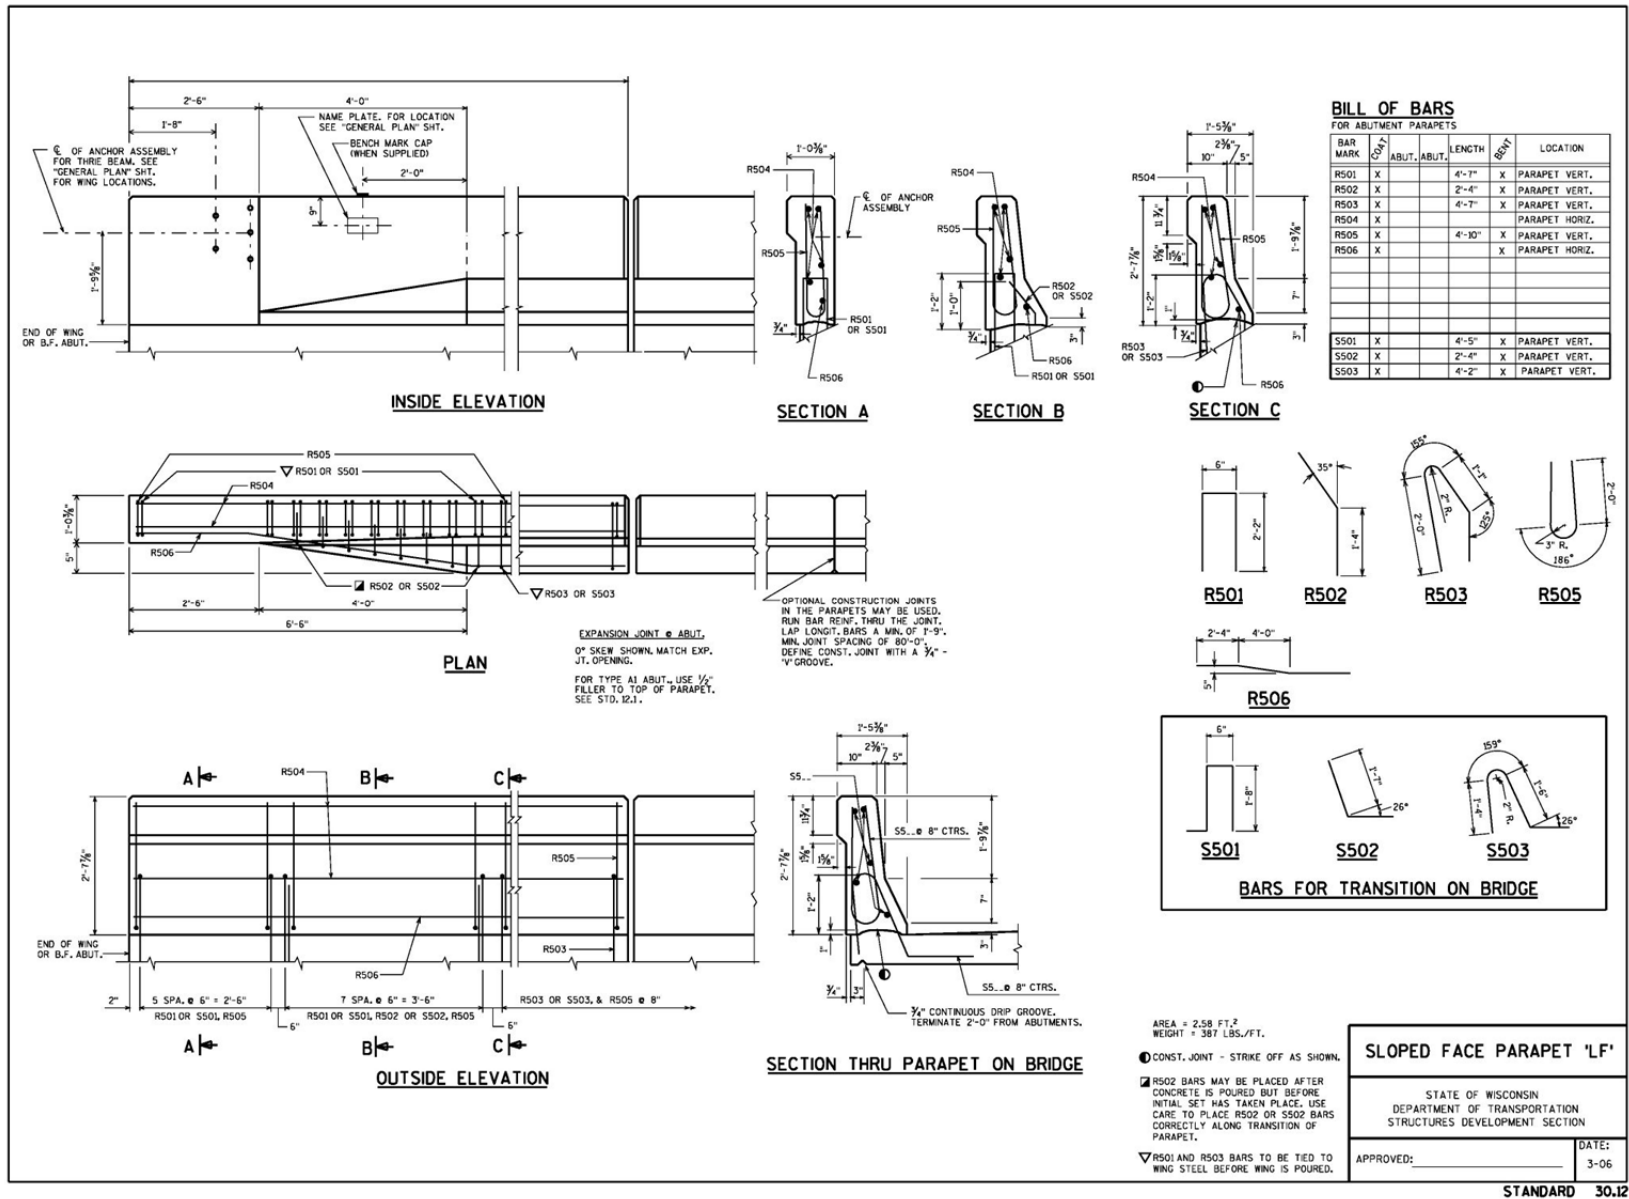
Wisconsin Sloped Face Parapet "LF" [45]
